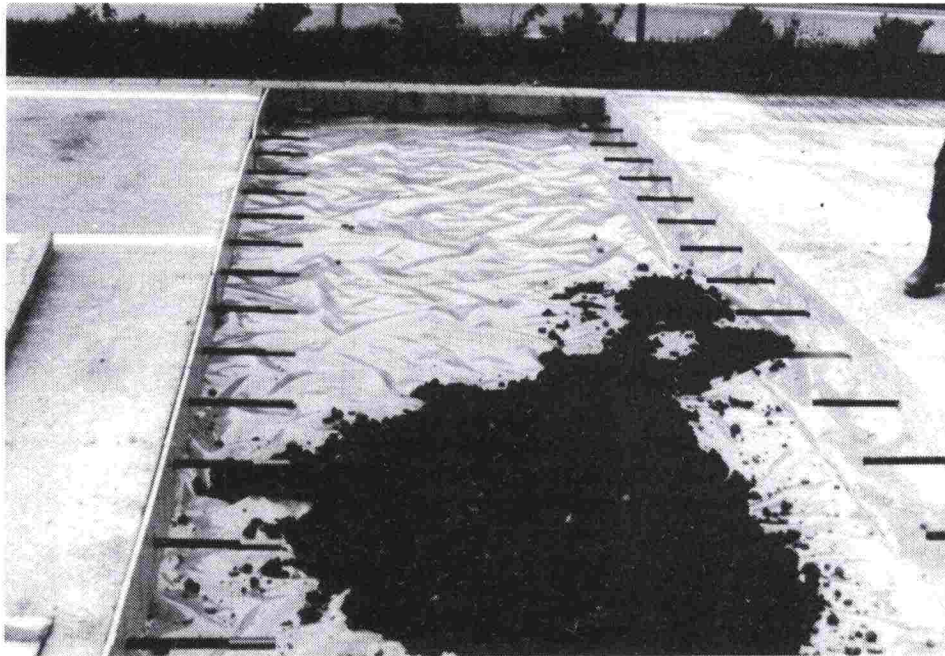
A full depth repair: dowel bars placed, the base compacted, casting with super-plastizised concrete can be started
